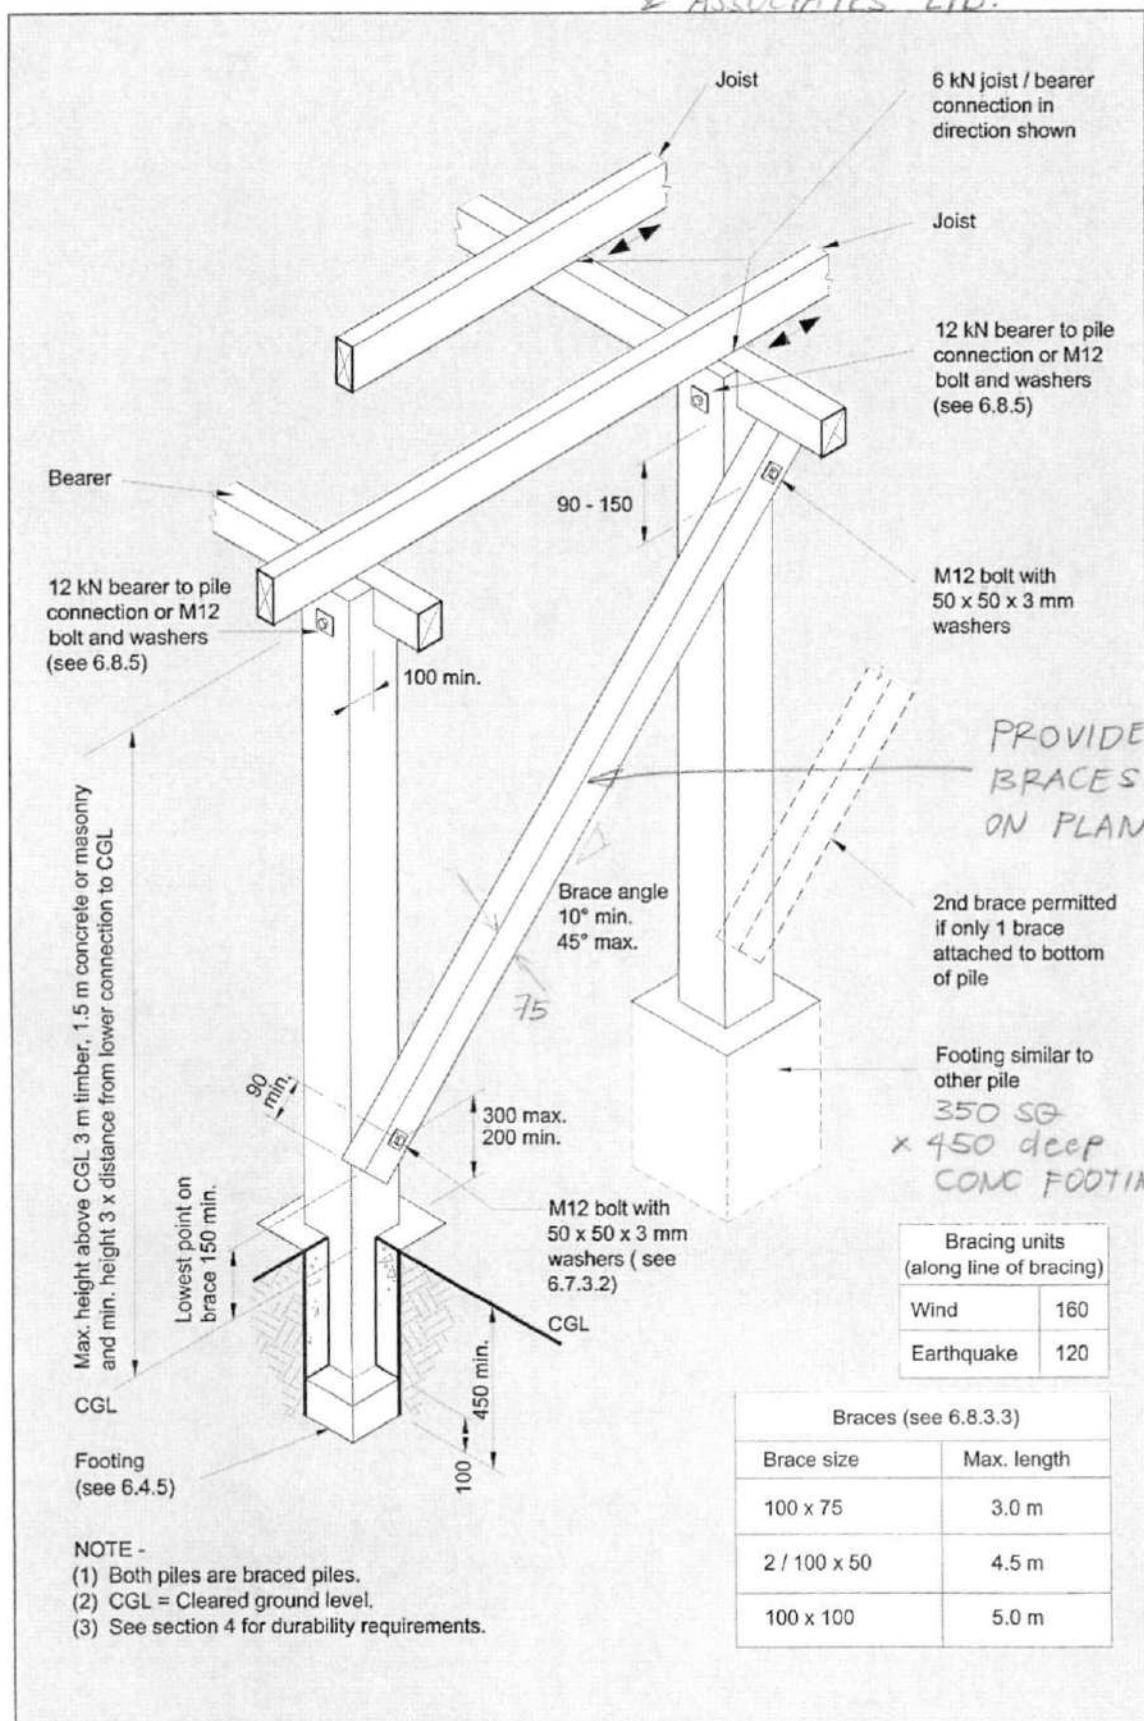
Braced pile system - Brace connected to pile (see 6.8)
